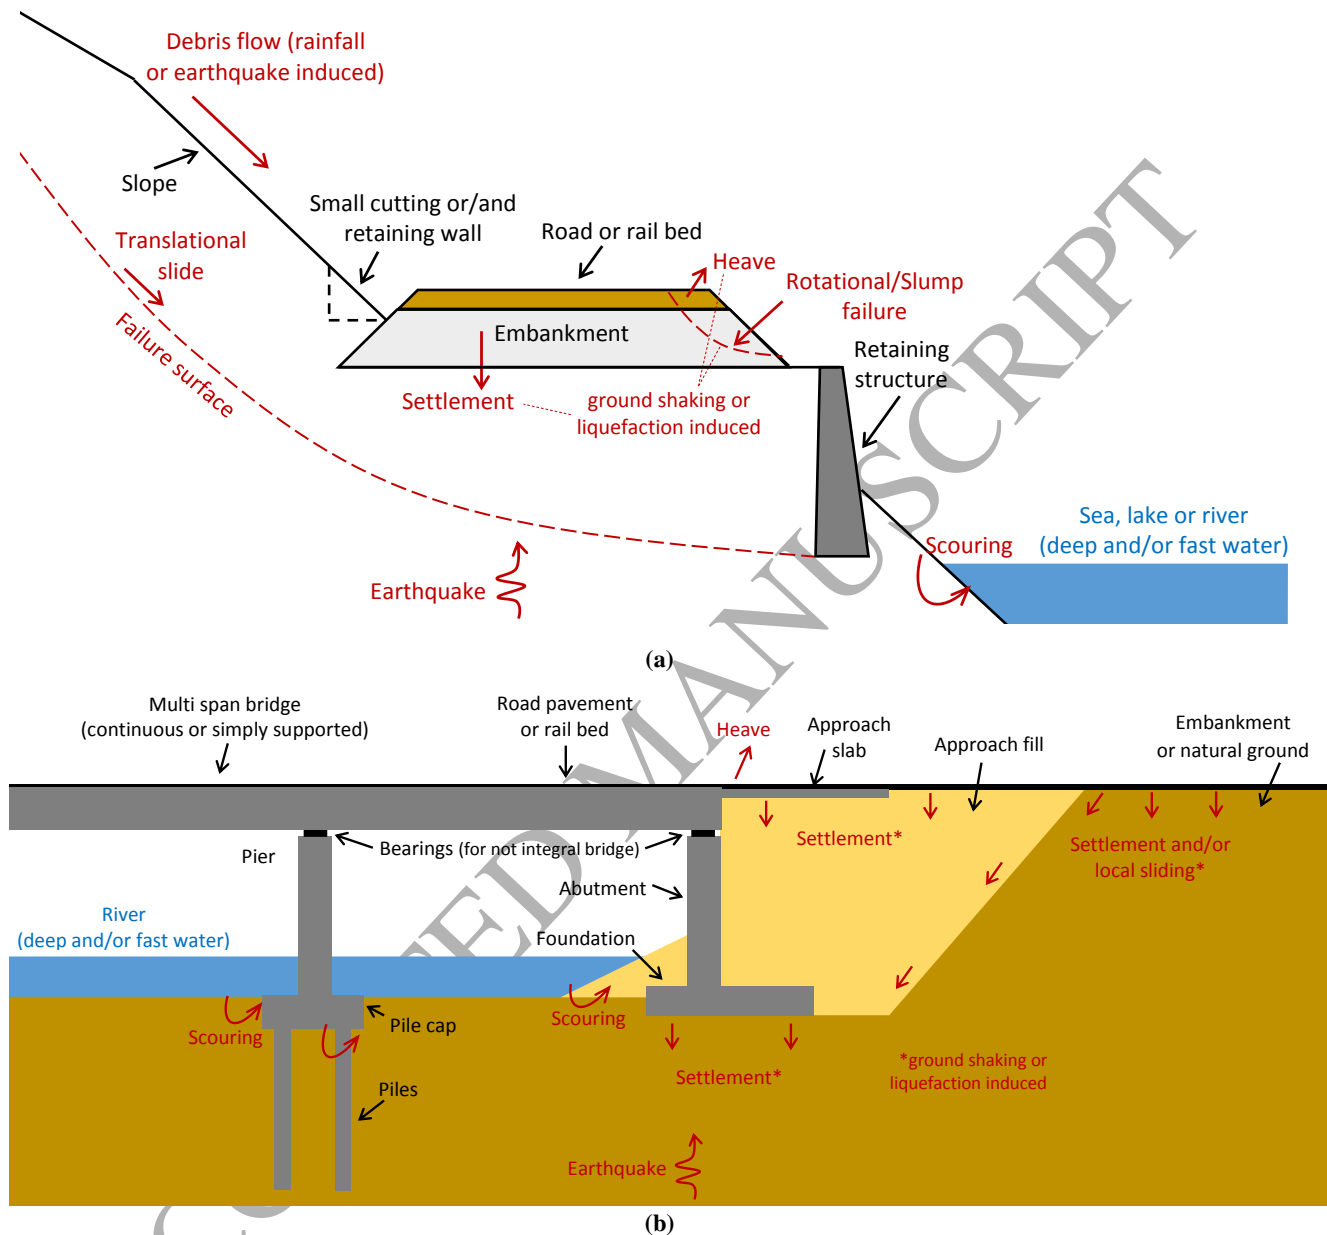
Multiple hazard effects on representative transport System of Assets (SoA): (a) embankment, slope, retaining structure, (b) bridge, abutment, foundations, backfill.
